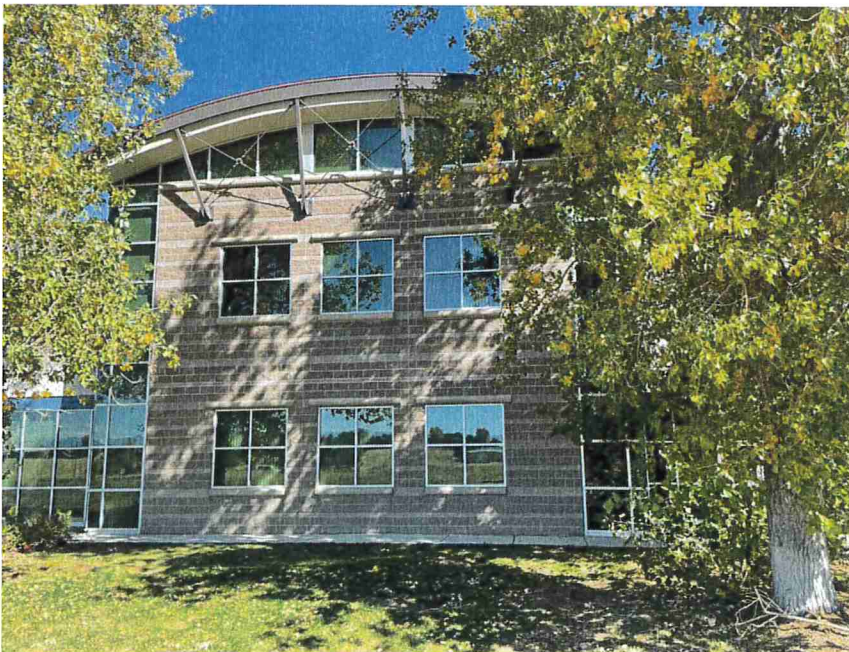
View of the west elevation showing the curved profile of the metal roof.
